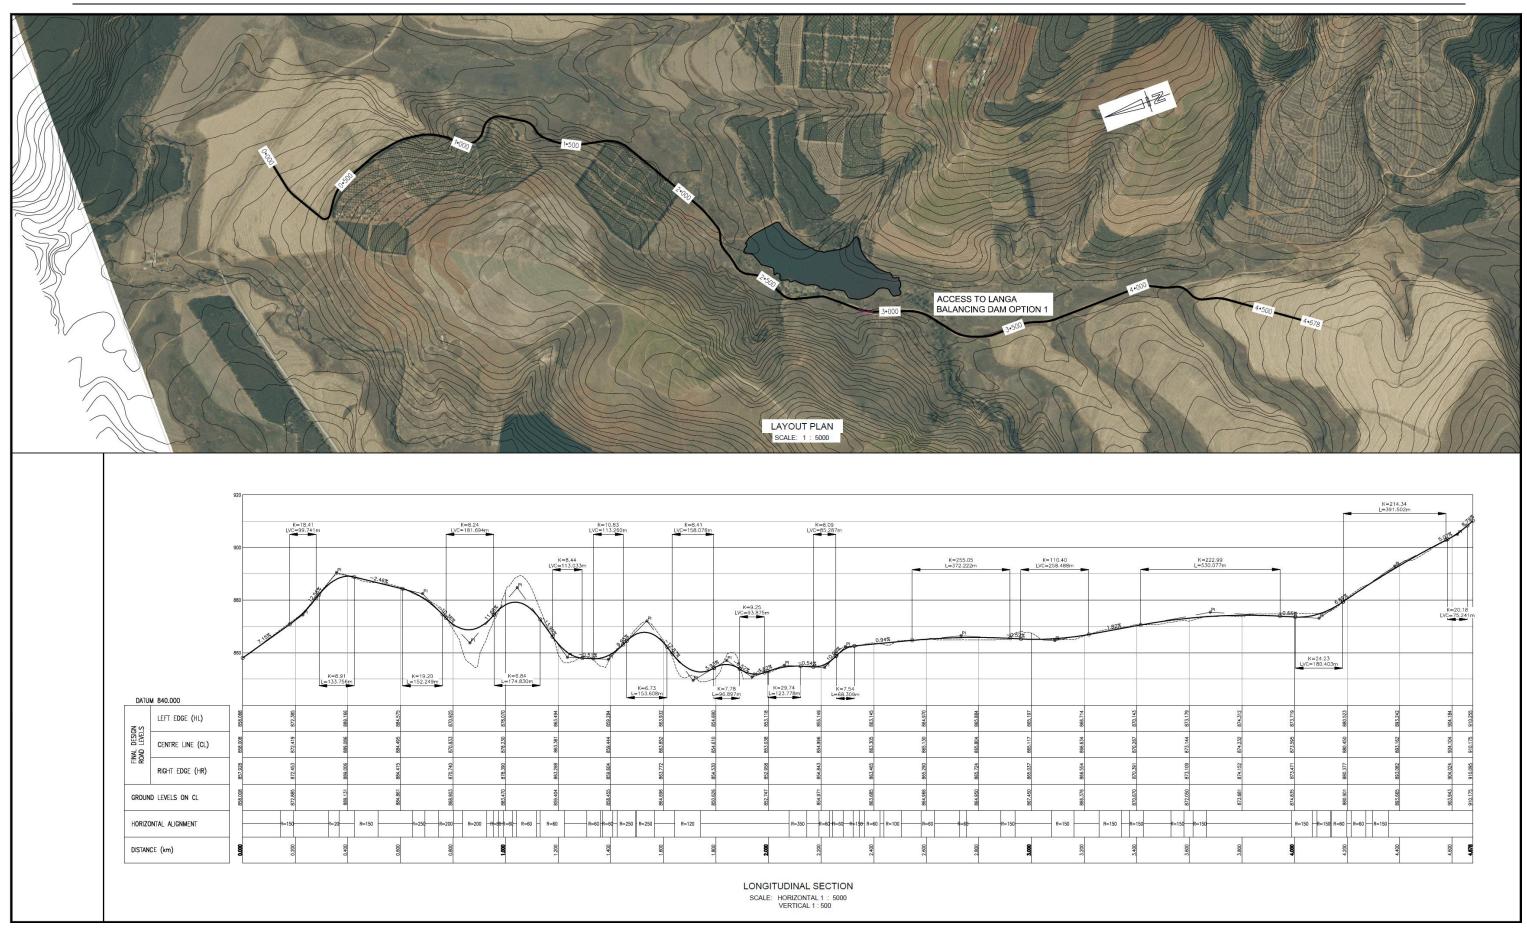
Langa Dam – Layout plan and longitudinal section of access road to tunnel outlet portal and Langa Dam Option 1
